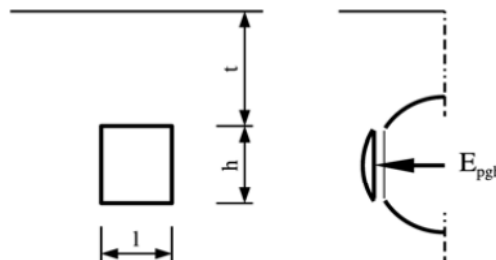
Plate laterally pressed into the tunnel side. Left: side view; Right: cross section [53]
